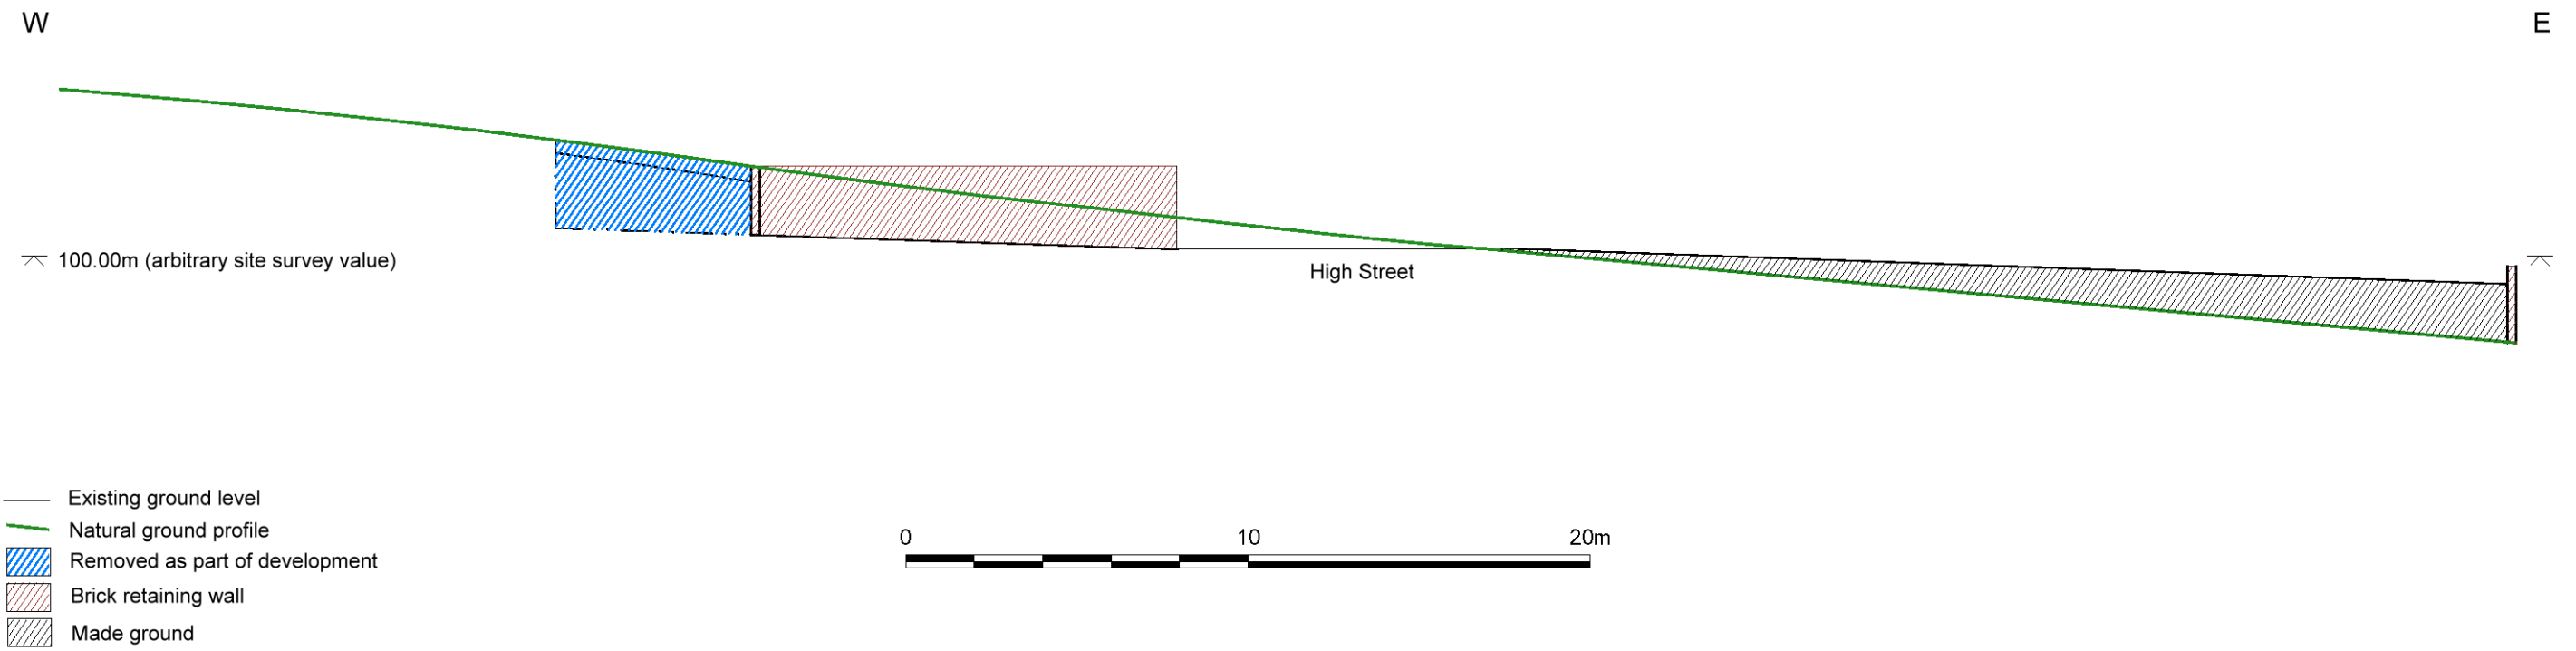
Profile across the site showing the original ground level and areas of terracing (scale 1:200)
